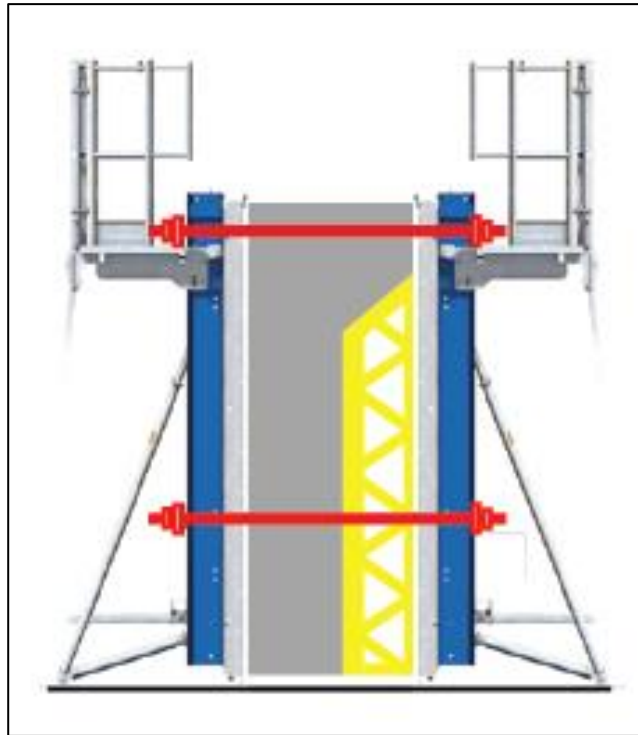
Formwork and recess for building a concrete core wall with a corbel
